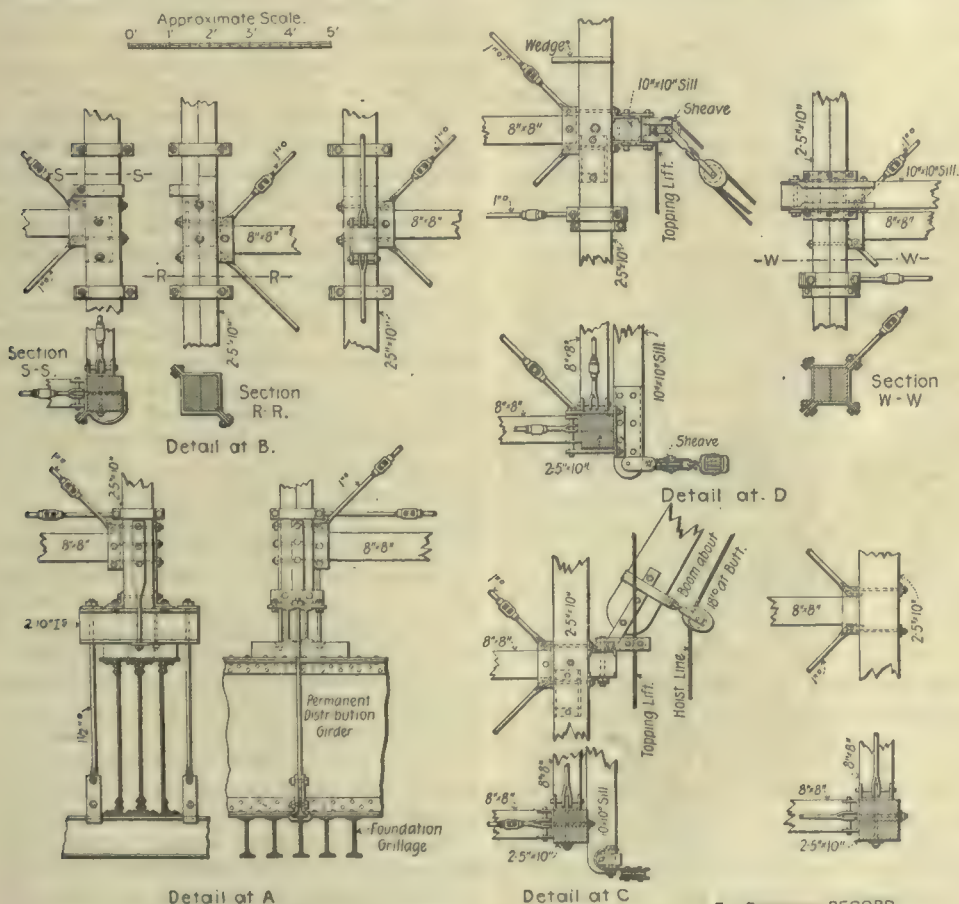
DETAILS OF TOWER AND BOOM CONNECTIONS.
